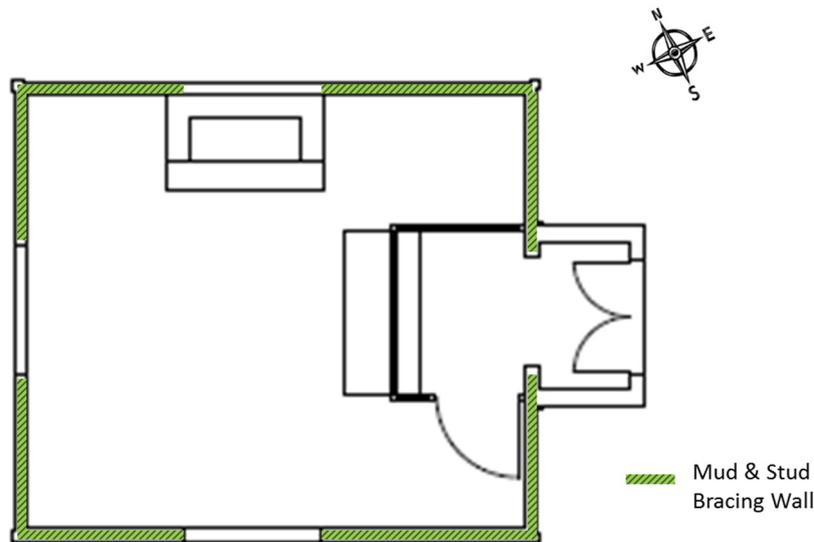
Building Layout and Location of Mud & Stud Bracing Wall
